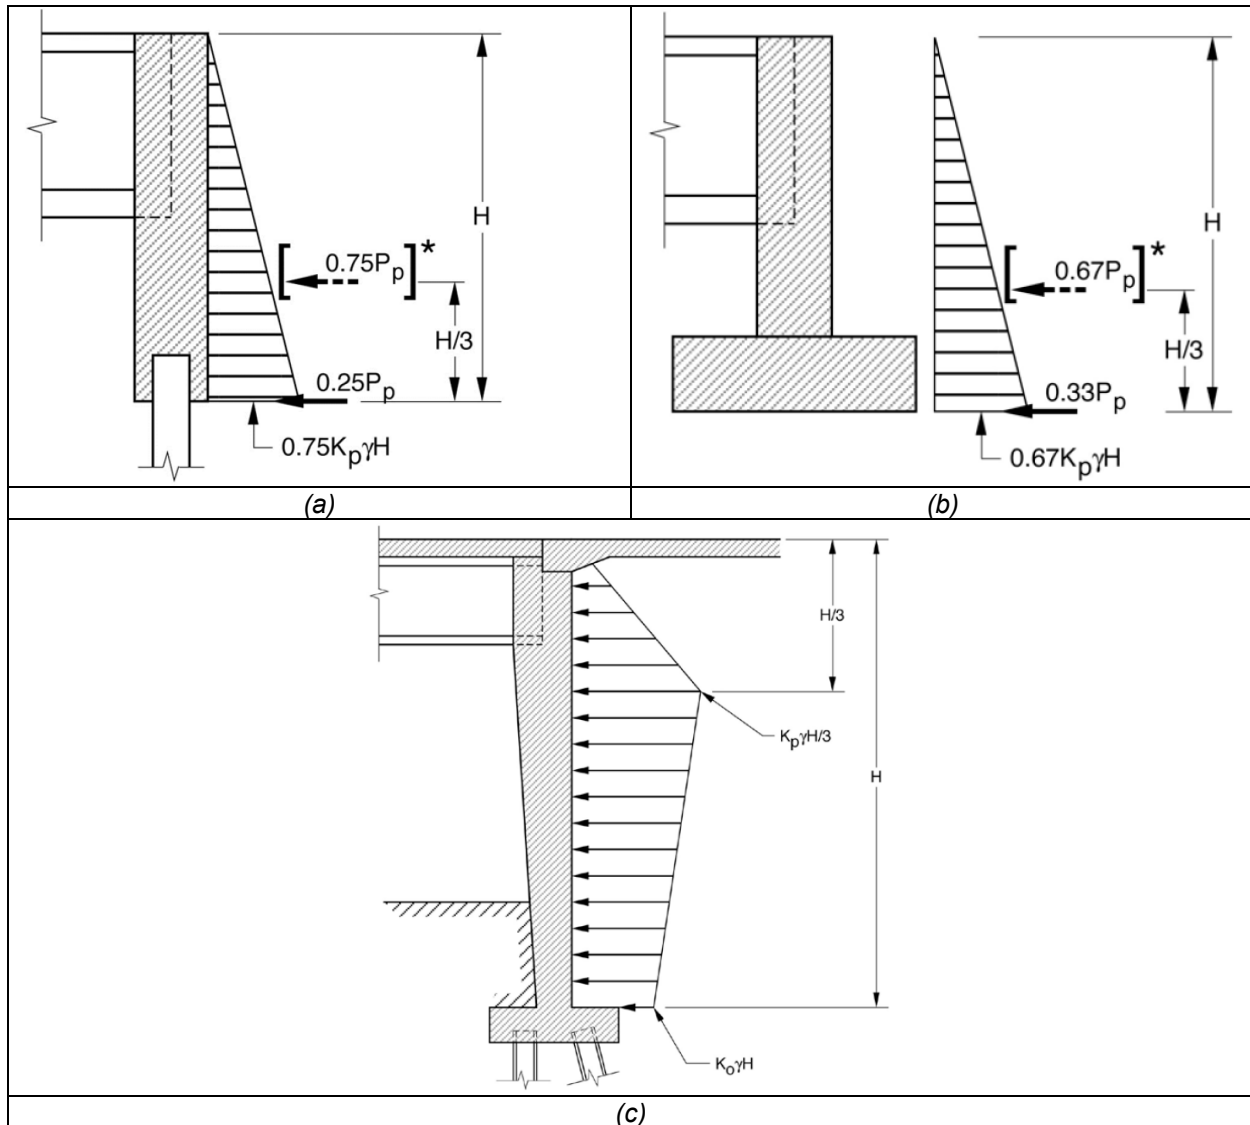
Lateral earth pressure distribution on integral abutment backwall: (a) stub abutment on piles; (b) stub abutment on shallow foundation; and (c) full height wall abutment (Oesterle and Tabatabai, 2014)
